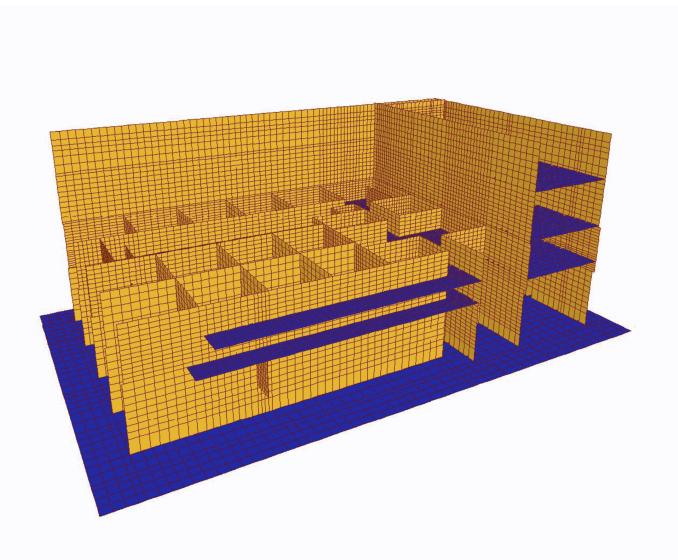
H.3-7 Radwaste Building SAP2000 Model (South Wall, West Wall, Roof and El. 35'-0" Slab Removed)
